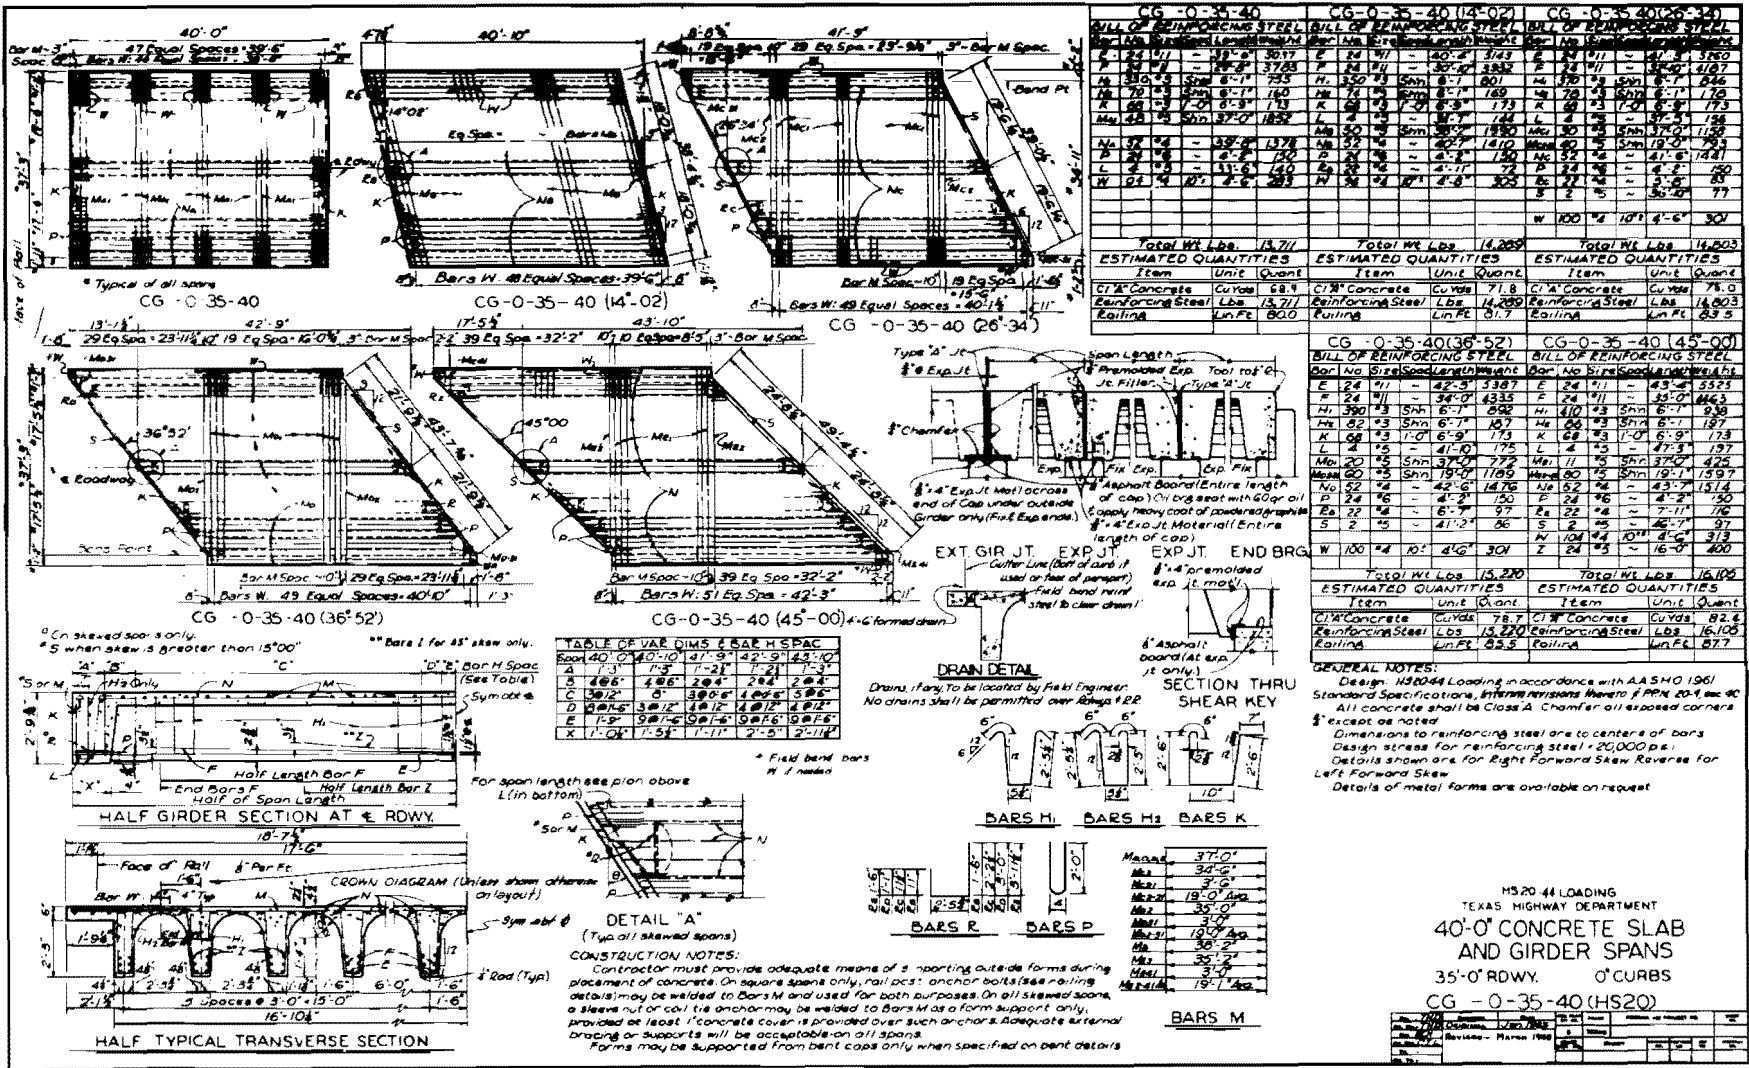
Texas Highway Department Plan Sheet, CG-0-35-40.
